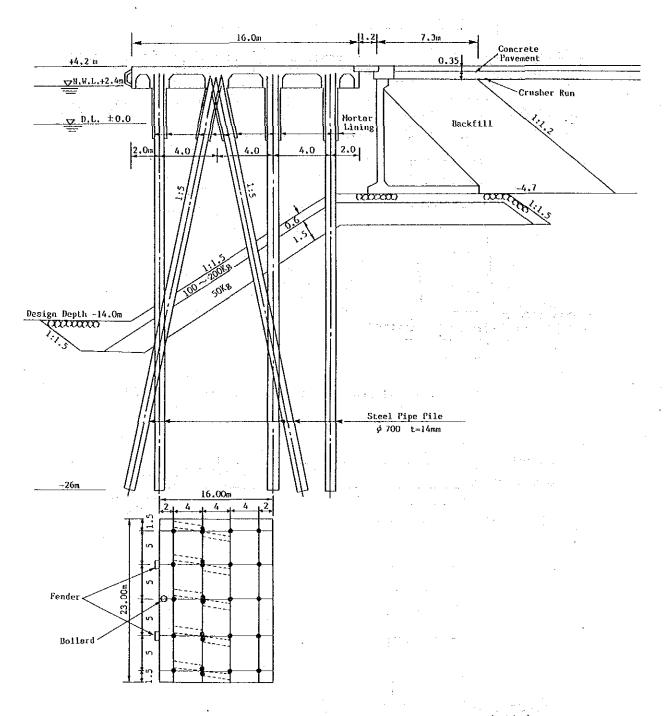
Proposed Cross Section of the Berth (-14m) (Alternative)
